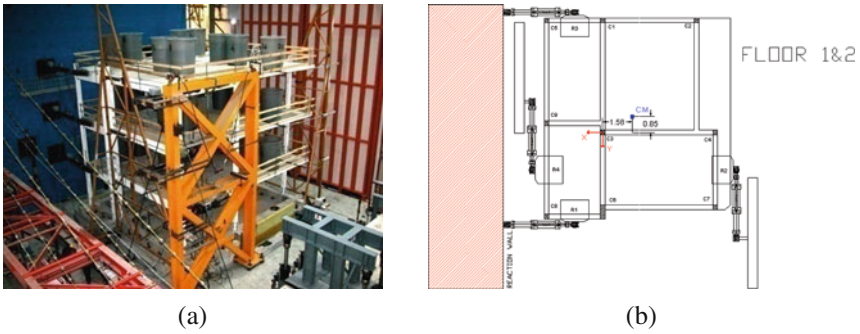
3D tests on a full-scale model of a torsionally unbalanced RC structure: (a) View of the model at the testing site; (b) Actuators layout and location of floor centre of mass (CM)
